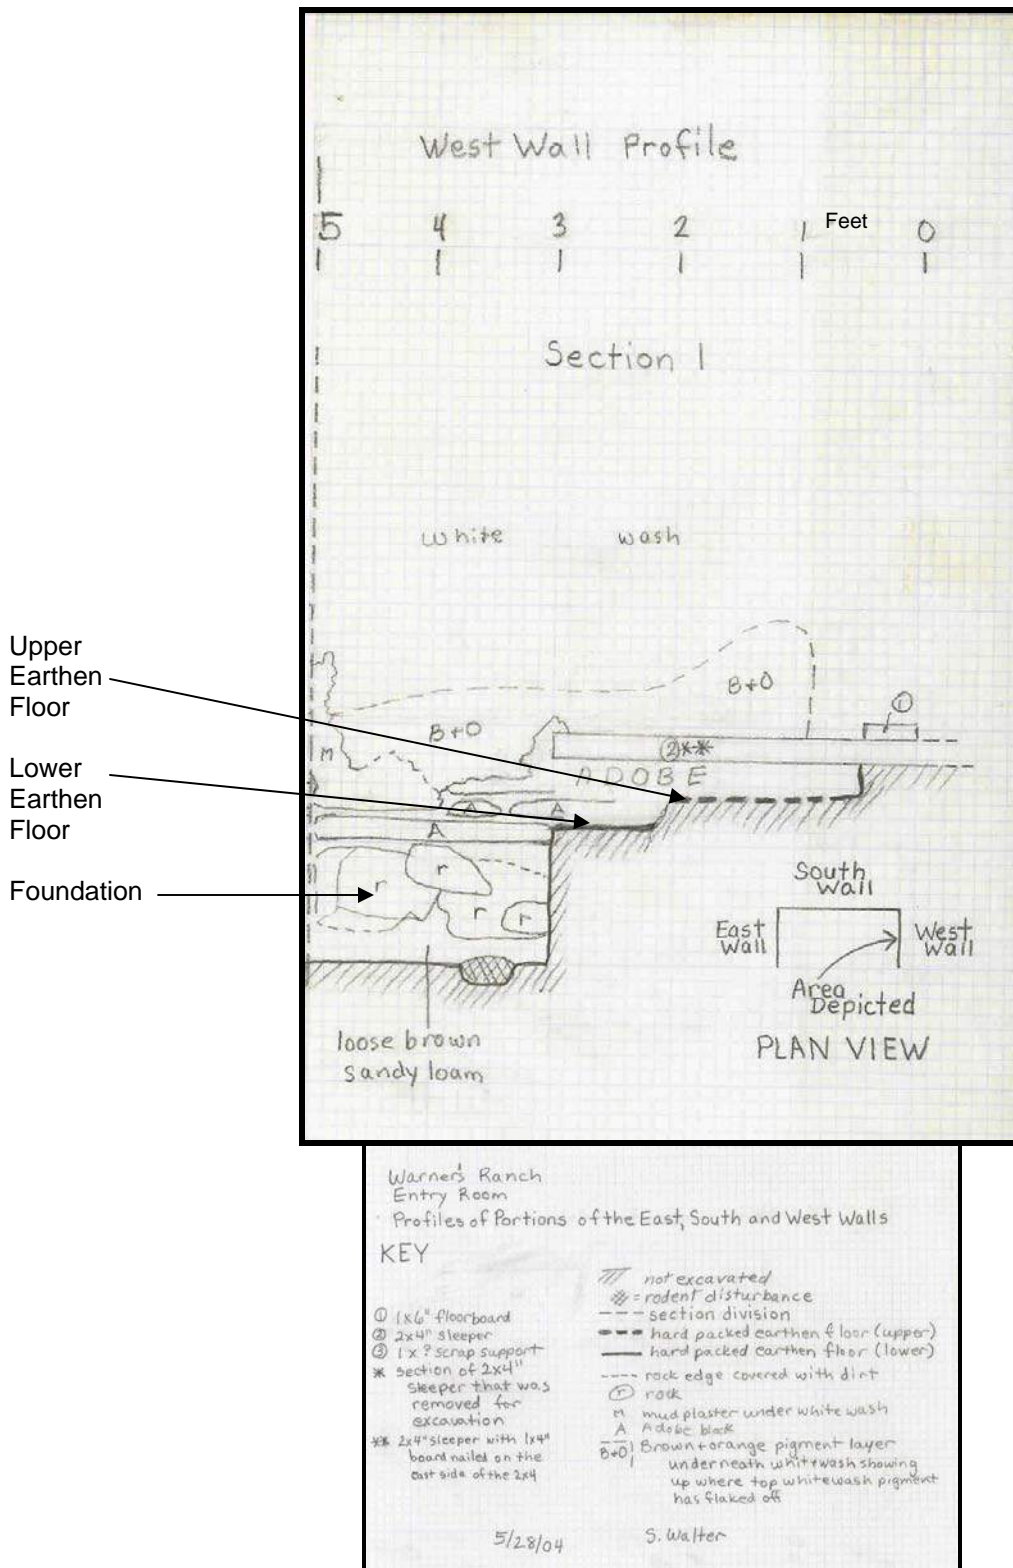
West wall profile of Entry Room (101) block excavation Section 1 following excavation of the unit in the southwest corner. Most of the same features can be noted as in the east wall profile of Section 6 in Figure 37.
